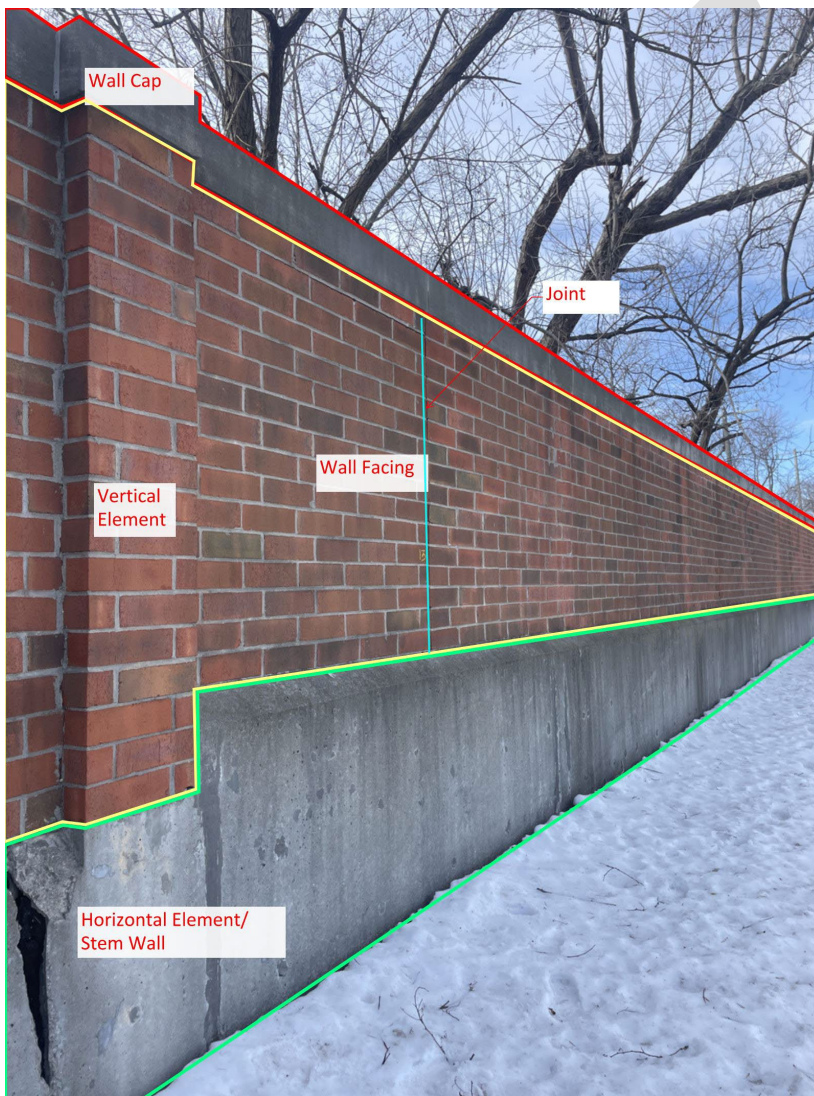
Noise Wall with masonry block indicating T-wall joint element
